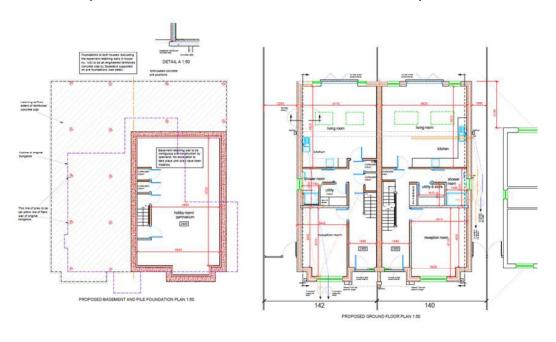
Proposed Basement and Ground Floor Plan (please note – larger version of plan can be found in the Committee Plan Pack)
